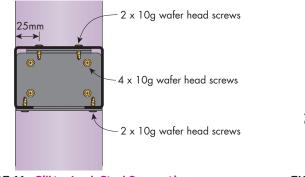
Sill to Jamb Stud Connection With Jamb Stud Connector Bracket Section
